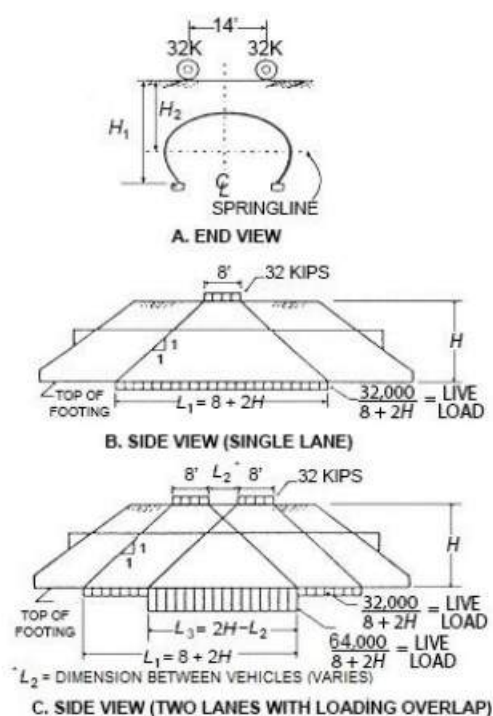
Live-Load Footing Reaction Due to Axles of the Design Truck, per Footing
